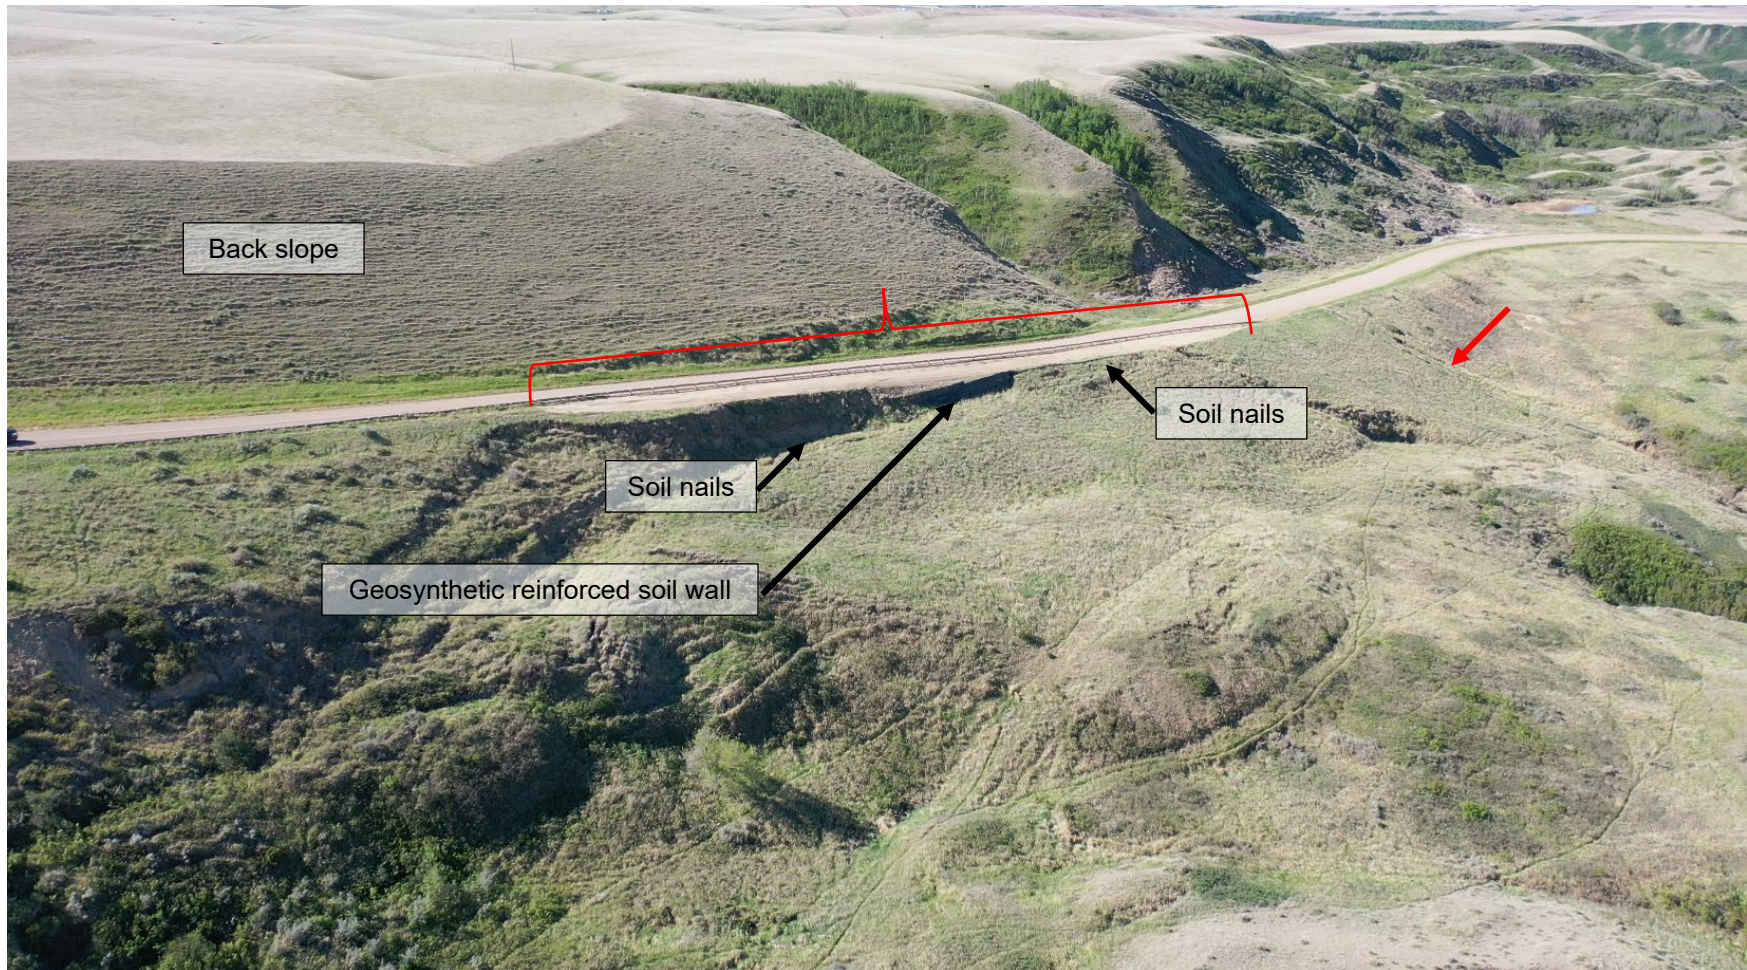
The guardrail and highway has been shifted approximately 3 m south towards the back slope, narrowing the highway and south (eastbound) ditch. Photo taken May 31, 2022, facing southwest.
